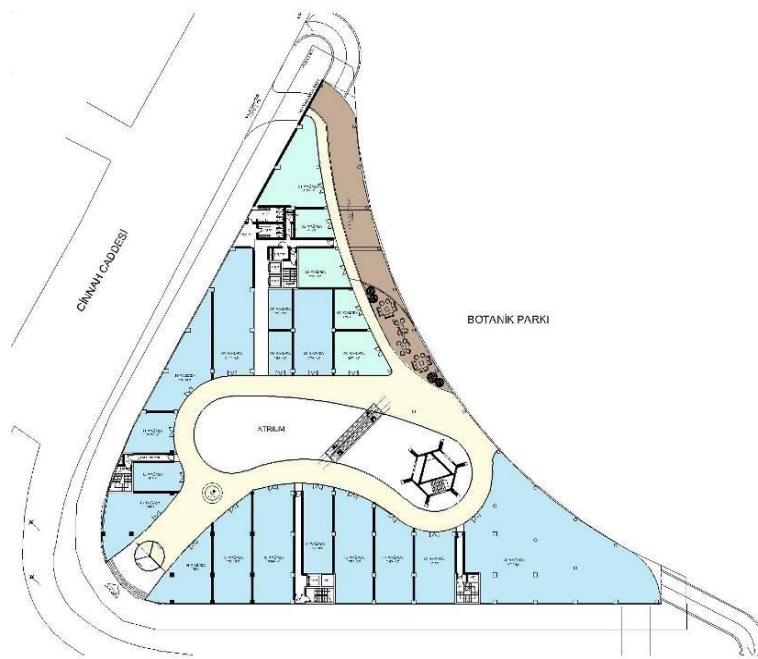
The ground floor plan of one of the proposals drawn by A Tasarım Mimarlık
